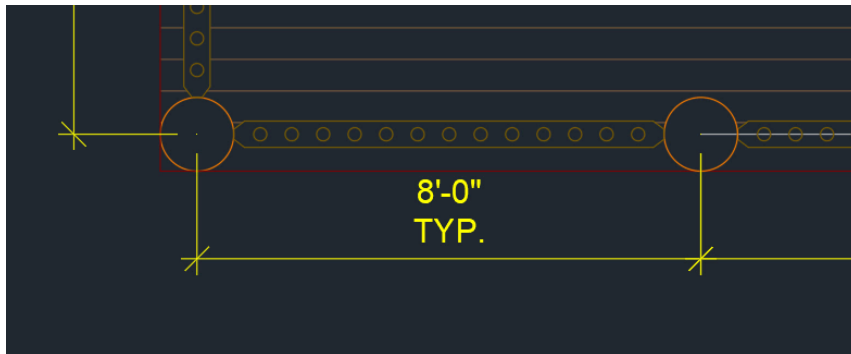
Dimension with measurement and Typical designation above the dimension line.
